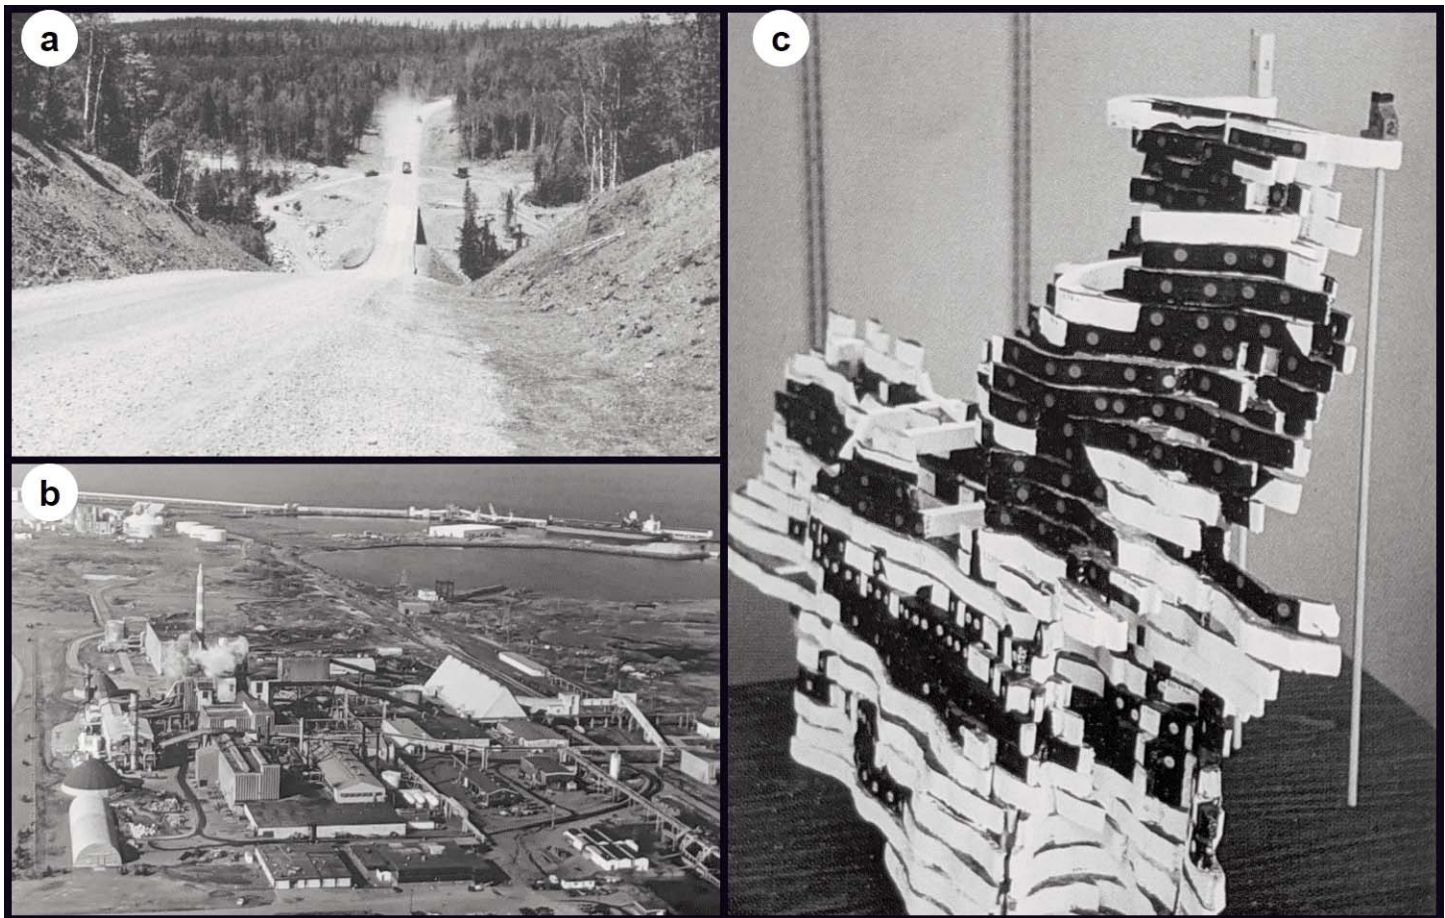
Other photos: a) road and bridge ('Heath Steele Bridge') over Nepisiguit River circa 1962, looking north (Our Miramichi Heritage Family archives); b) aerial view looking northwest at the Belledune smelter with the docks for the Port of Belledune in the background in 2000 (Bathurst Heritage Museum); c) a 3D model, created by Rhéal Godin, of the Brunswick No. 12 orebody in the mid-1990s, showing the #2 and #3 headframes (top), the #2 shaft and the various levels in the mine; black areas are mined-out stopes and white areas are unmined (from Gallagher 1997).
